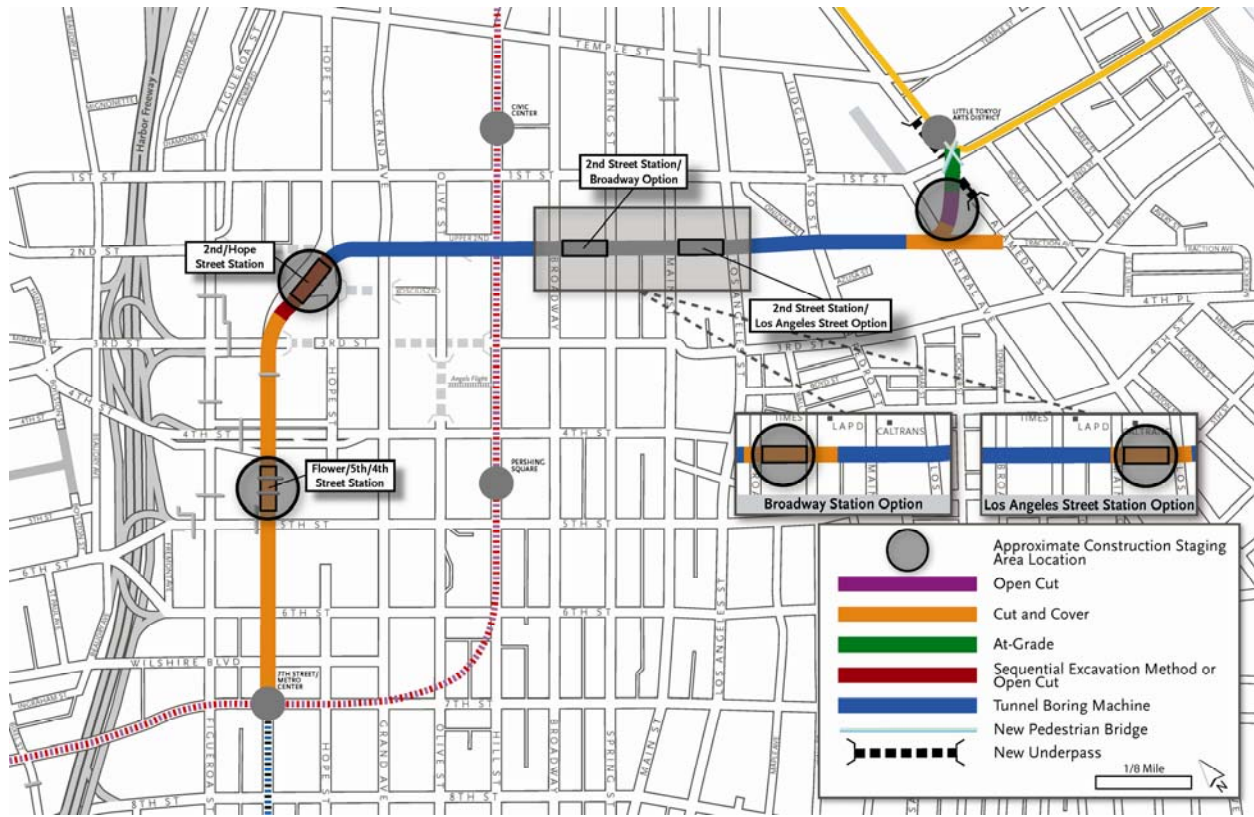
Underground Emphasis LRT Alternative – Construction Staging Site Locations and Construction Methods
